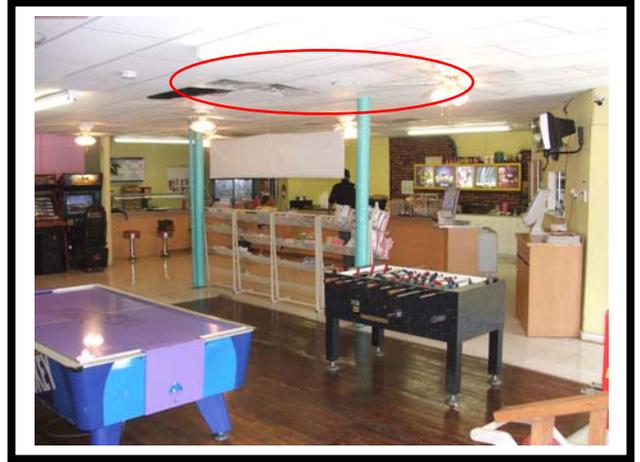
Bldg 3704/3706. Mexican Shop. Courtesy view of interior. Leak stains and missing tile at ceiling,
